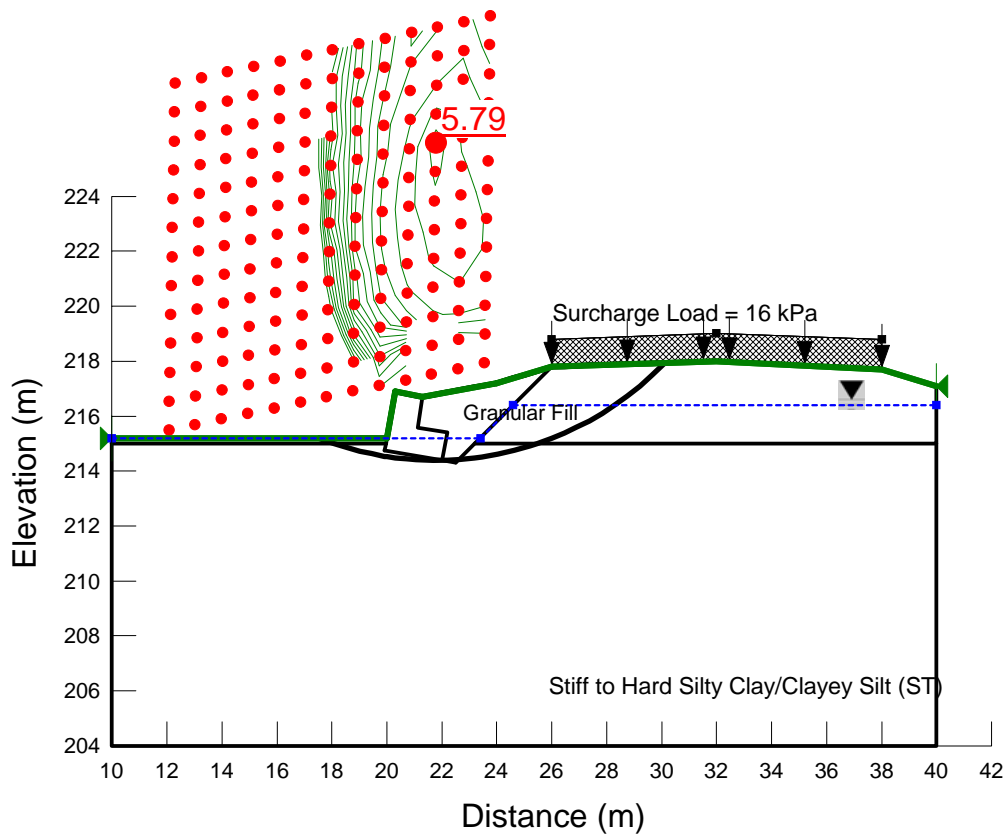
Slope Stability Analysis of Proposed Retaining Wall - Sta. 26+521
